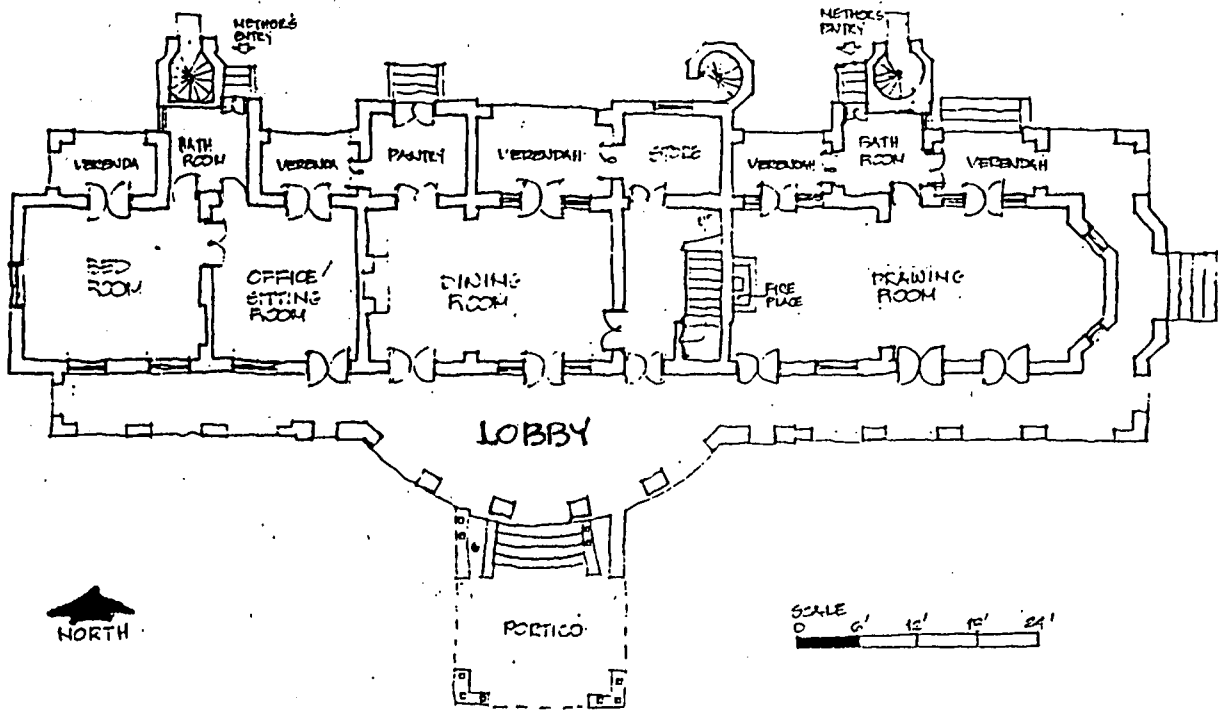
Ground floor plan, Chimmery, Barisal
